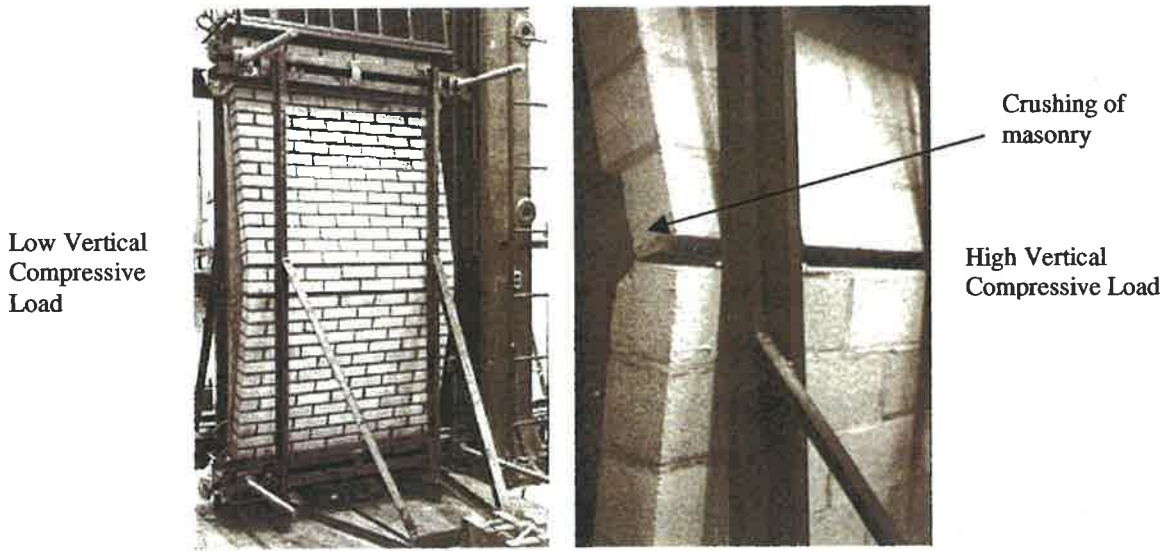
Typical Lateral Failure of Brick Wall
